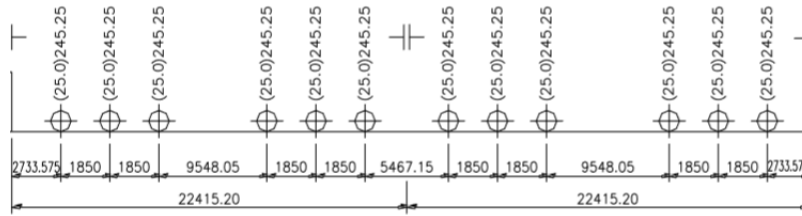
Loading Conditions for : Double Headed Diesel Loco
